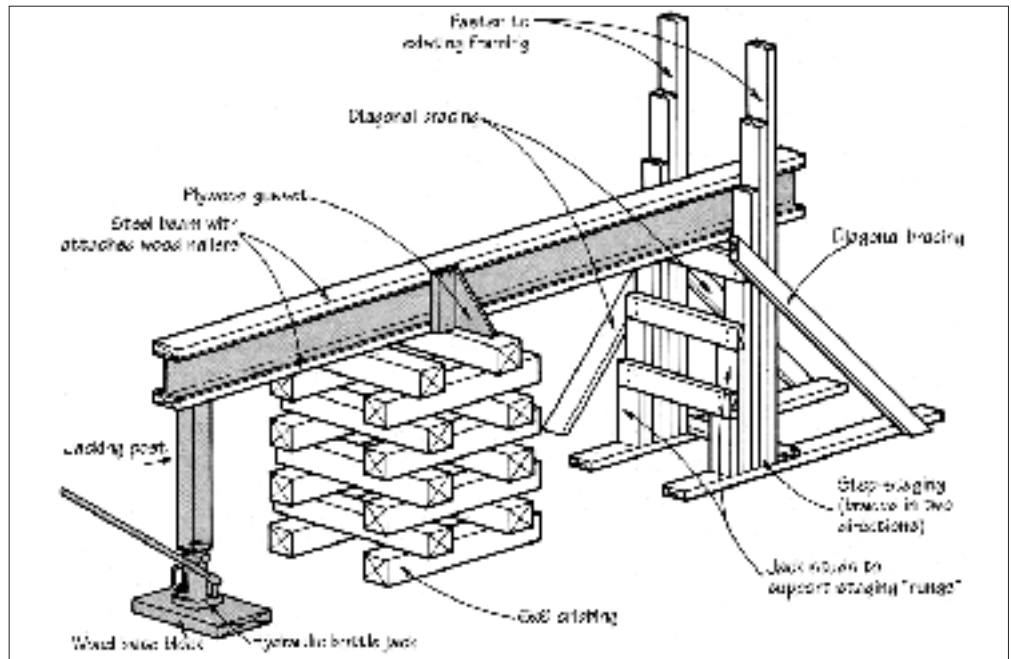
When a hoist or crane is impractical, you can lift a steel beam into place with one or two hydraulic bottle jacks. Build a crib or step-staging to temporarily support the beam while you reset the jacks. Work the beam from the ends, but don't let one end get too much higher than the other or the beam may slide. Plywood gussets attached to wood nailers will help keep a tall beam from tipping.
